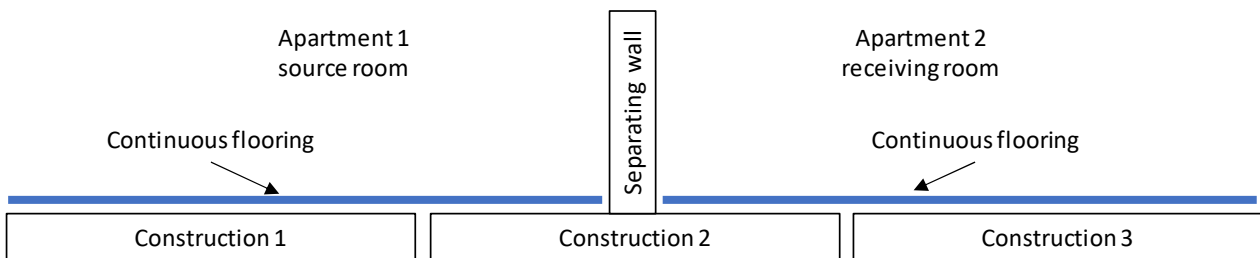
Schematic view of constructions and separating wall between two adjacent apartments.
